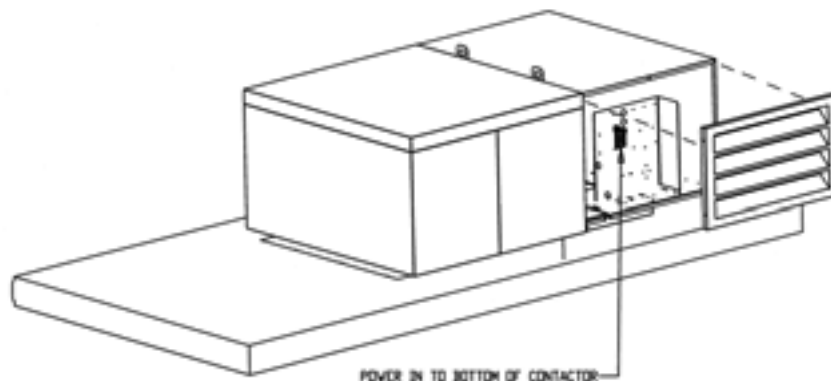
Power Hook-Up for Polar Pak Top-Mount Coolers and Freezers
